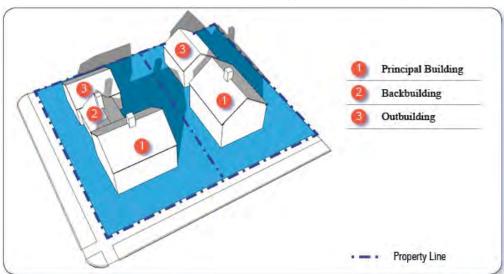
A42.10 PRINCIPAL BUILDING/BACKBUILDING/OUTBUILDING
